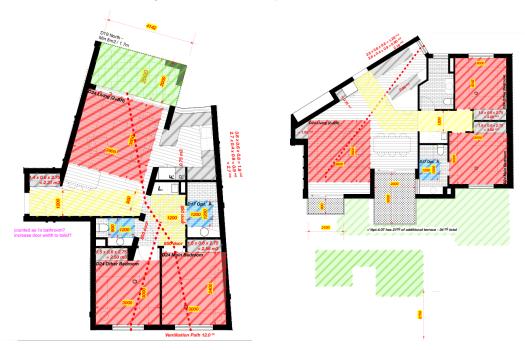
Typical 2- & 3-bedroom adaptable apartments
